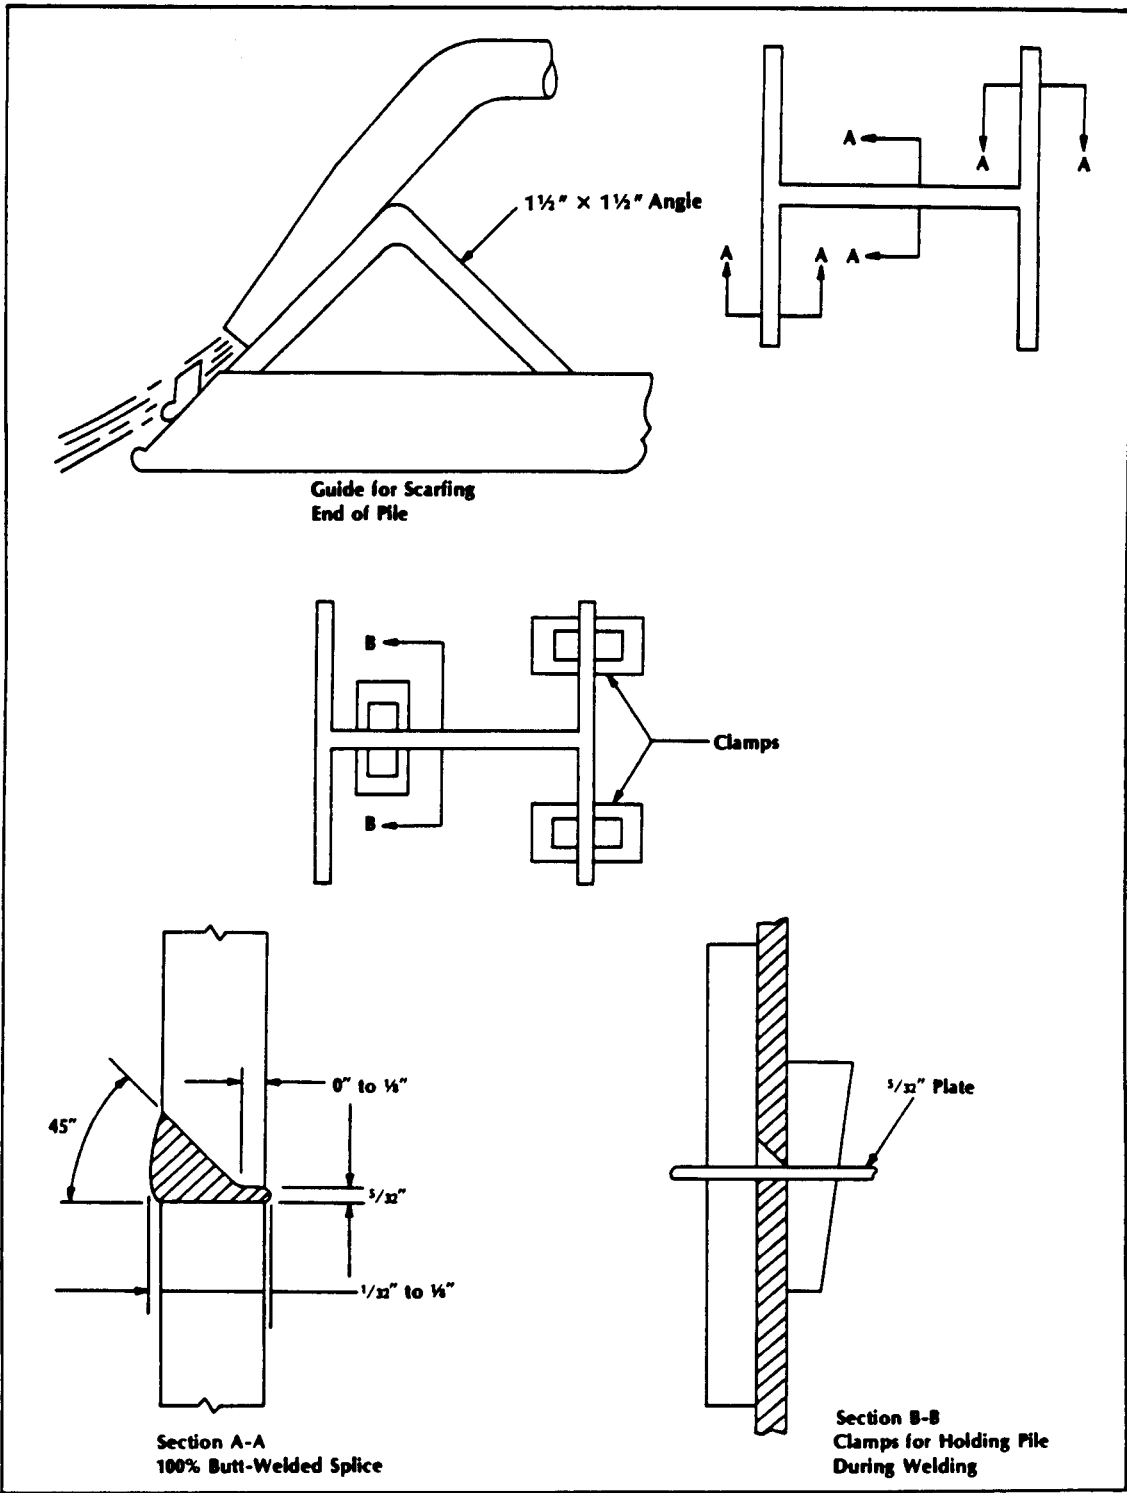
Butt-welded splice, welding clamps, and guide for scarfing
